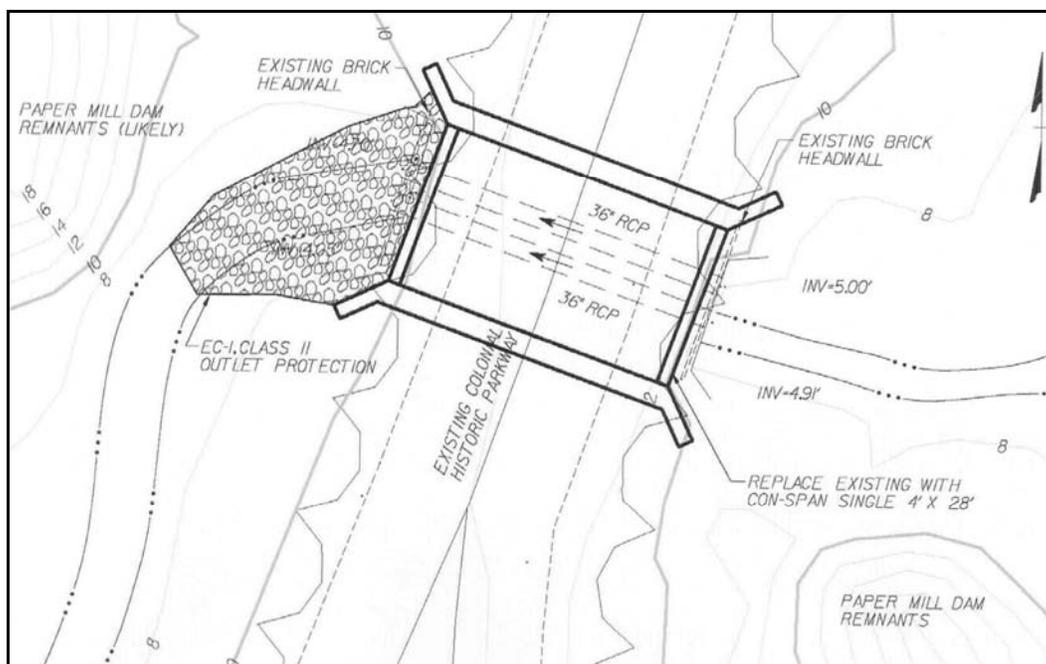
Concept Plan of Alternative 2 at Site B (Replace Existing Culvert with CON-SPAN Structure); Source: NPS, 2005
